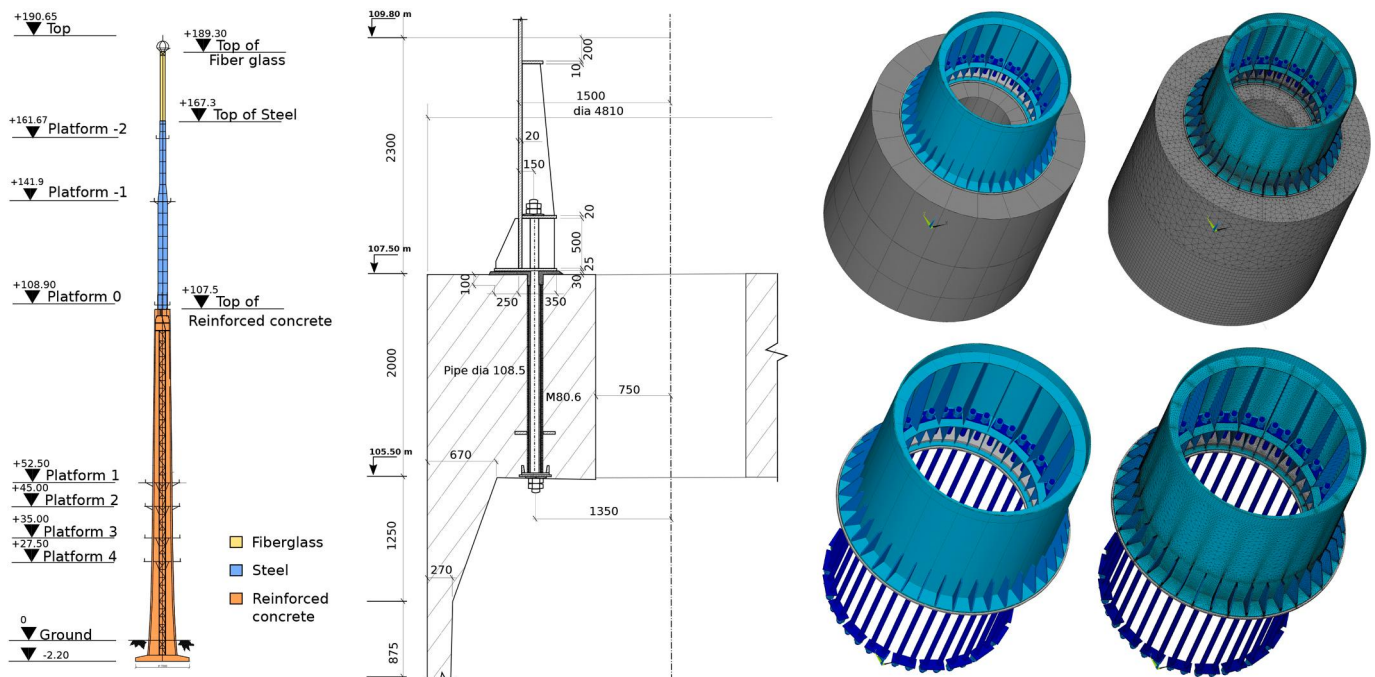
Numerical detailing of the connection block between steel and concrete section. (a) Geometrical overview of the TV tower. (b) Longitudinal cross-section of the connection block (all dimensions are in mm unless mentined). (c) A detailed finite element model of the connection block between steel and concrete section.
